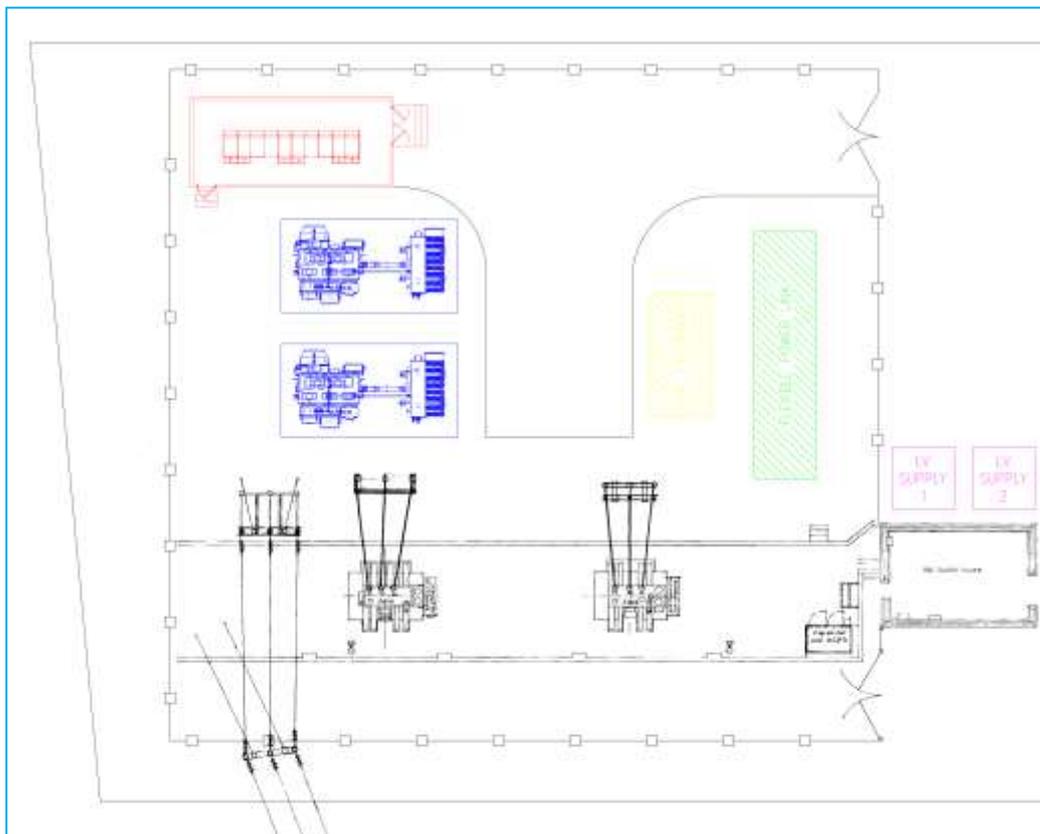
Proposed FPL and Switch House Layout for Exebridge
